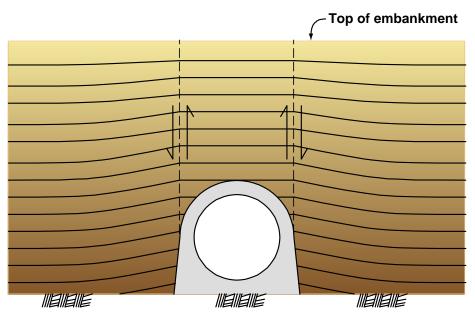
Conduit constructed prior to earthfill placement. Friction factors increase embankment load on the conduit as adjacent earthfill settles more than earthfill overlying the conduit.
